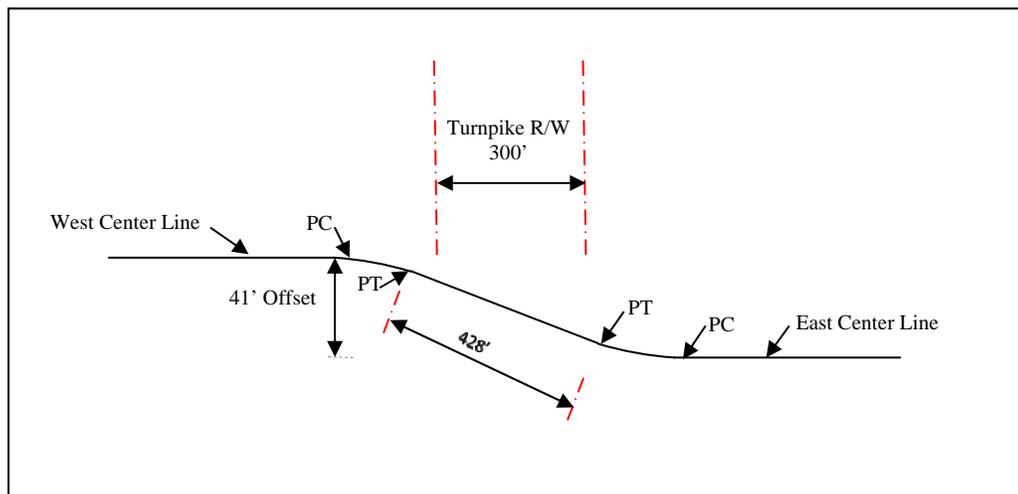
; Plan View, Preliminary Horizontal Alignment
